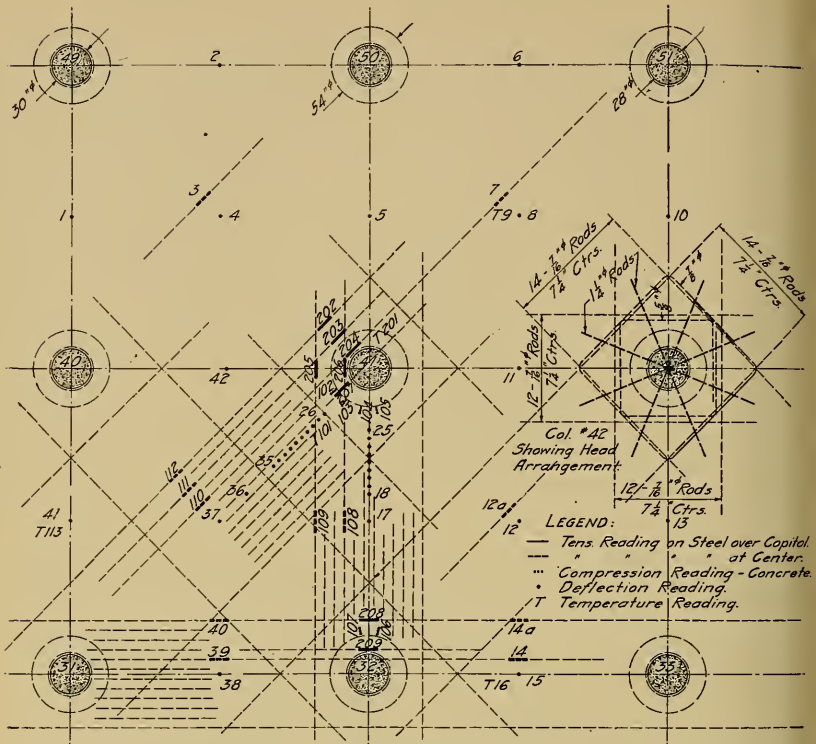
ARRANGEMENT OF REINFORCEMENT AND LOCATION OF OBSERVATION POINTS.
